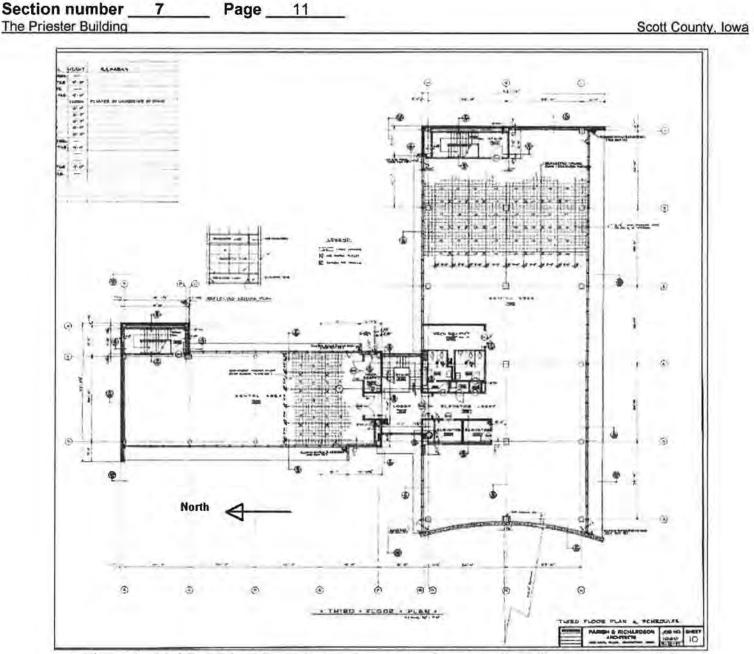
Third floor plan, dimensions and some notations erased and direction arrow added (Original architect's drawings, 1957, in the owner's archives)
